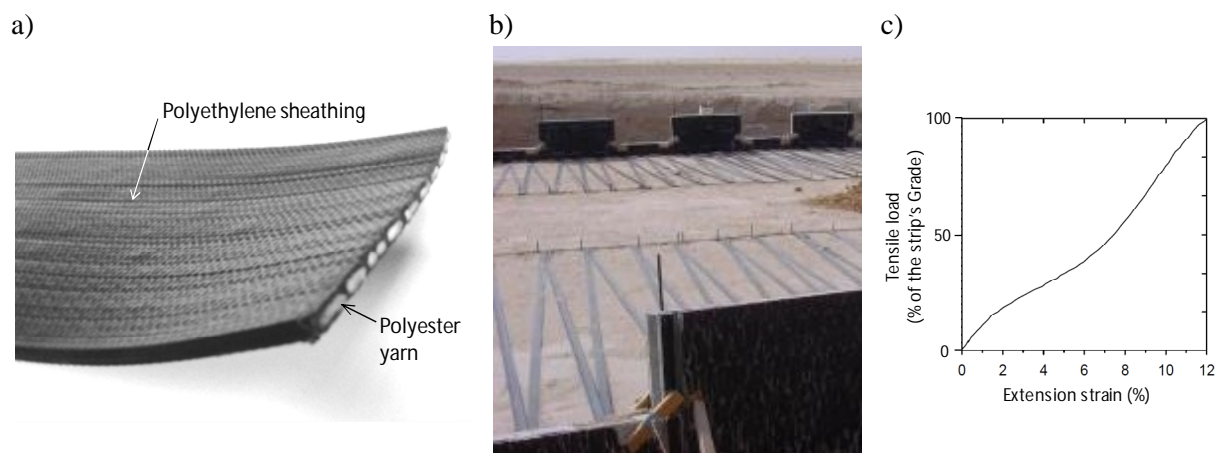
Polymeric strip detail (a), on-site installation example (b), and typical load-extension behaviour (c) of polymeric strips (Chamberlain & Cooper 2009).
